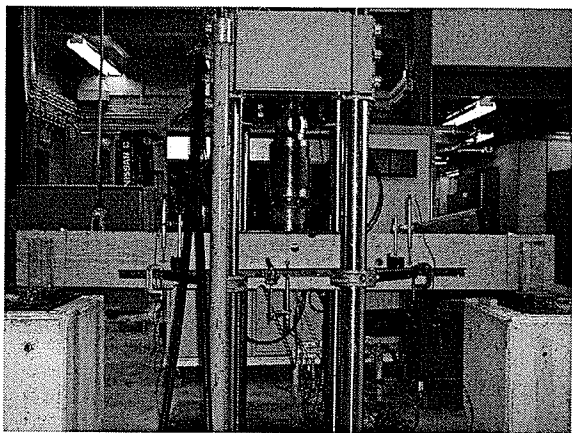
View #1 - 1000 kN MTS Machine Test Setup
